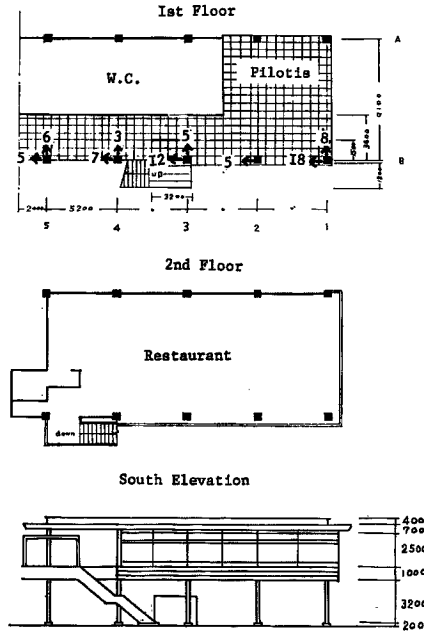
(a) Plans and elevations of "Tsuboya". Numbers at the heads of arrows in the 1st floor plan are displacements of 1st floor column tops to the direction of arrows in mm.
